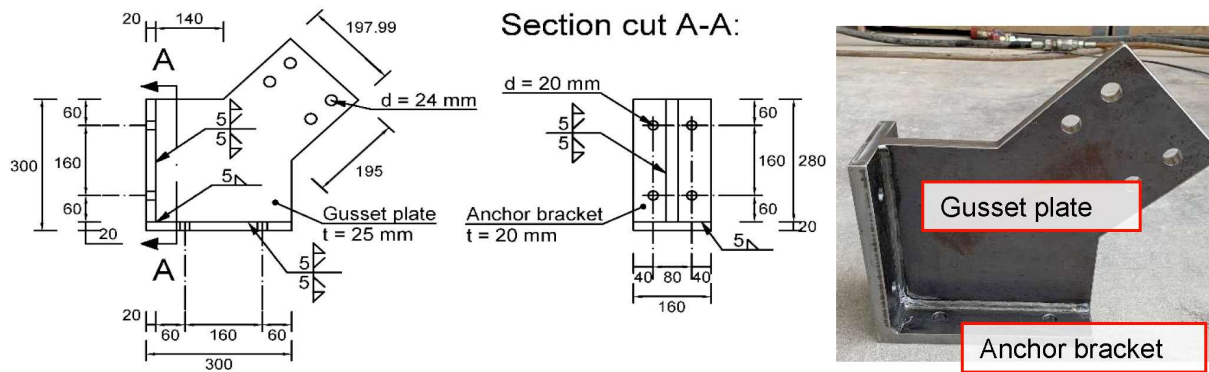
Dimensions of the bracket-to-gusset plate connection element comprising the anchor bracket and the gusset plate. (Note: All dimensions are in mm).
